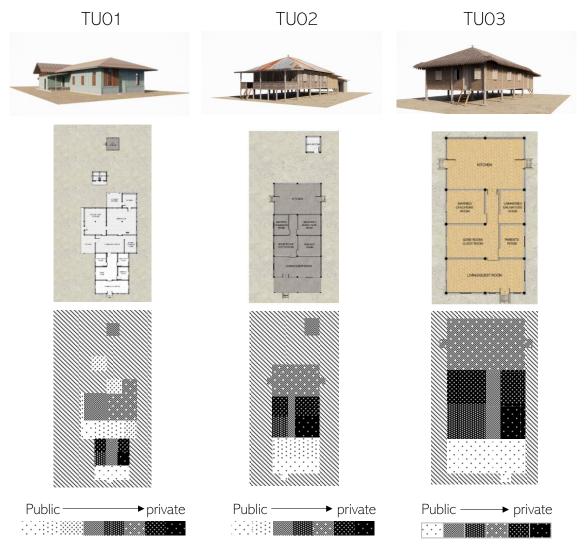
TU's houses in Lancang with 3D render, floor plan and layout analysis
